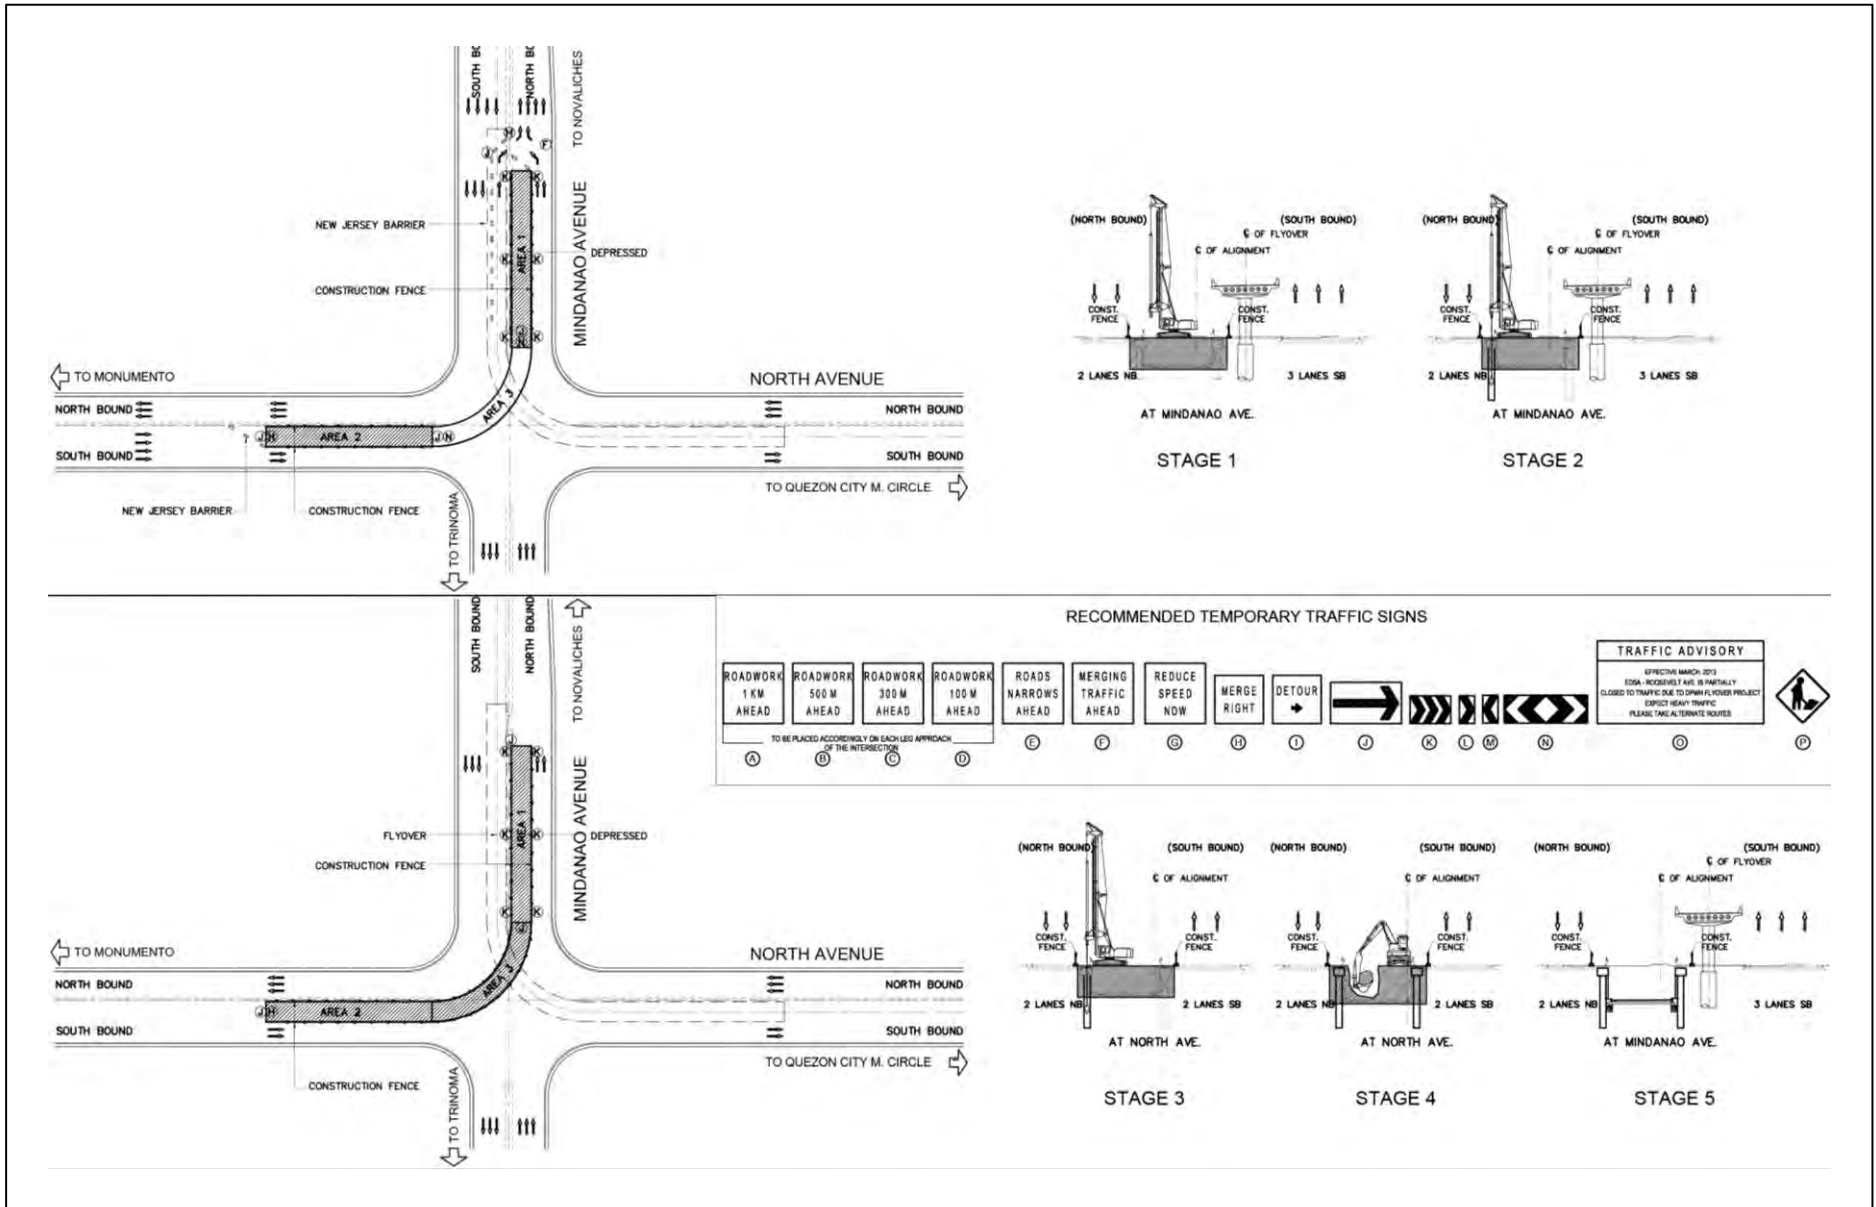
Construction Plan for North/Mindanao Ave. Interchange (4/4)
